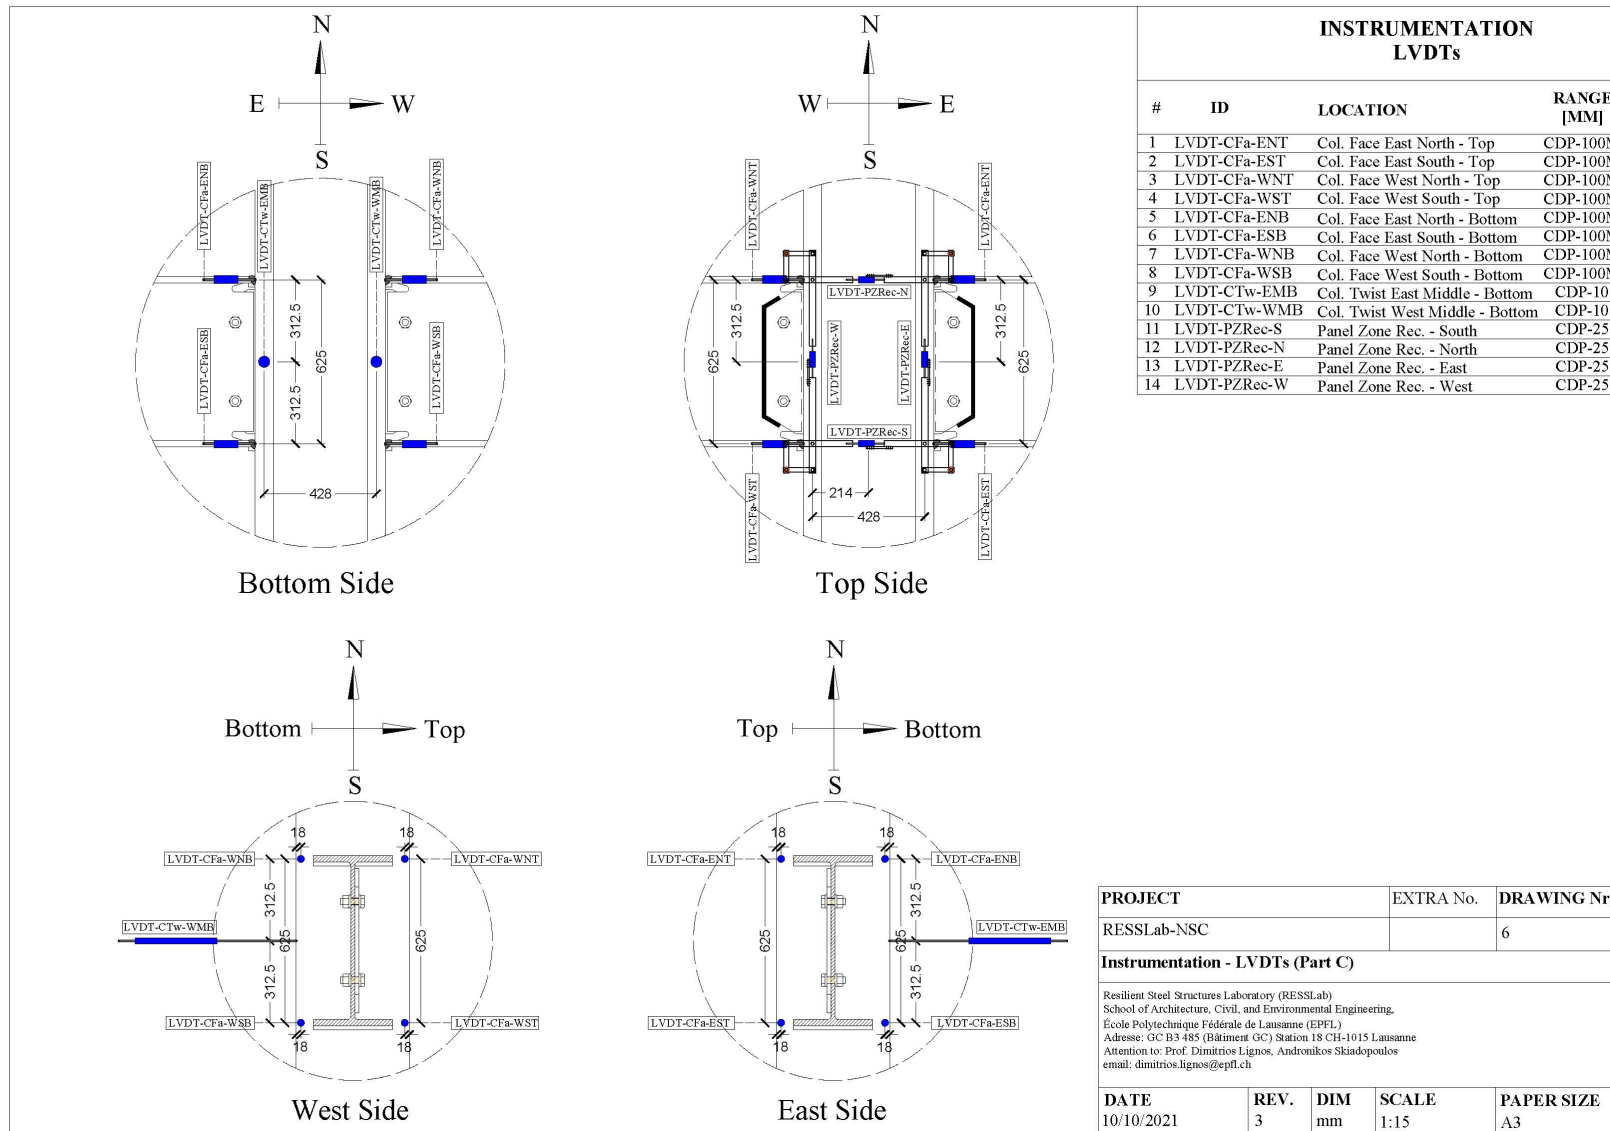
Instrumentation plan – LVDT (Part C) drawings.
